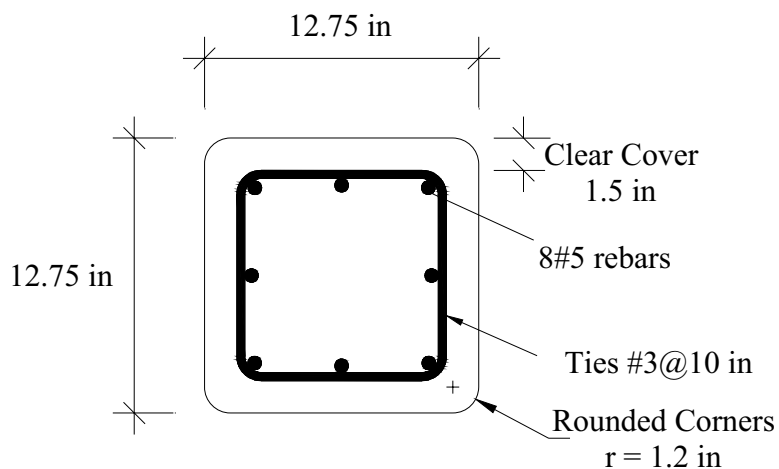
Section A-A & C-C; Specimens E1, E2 & E3
